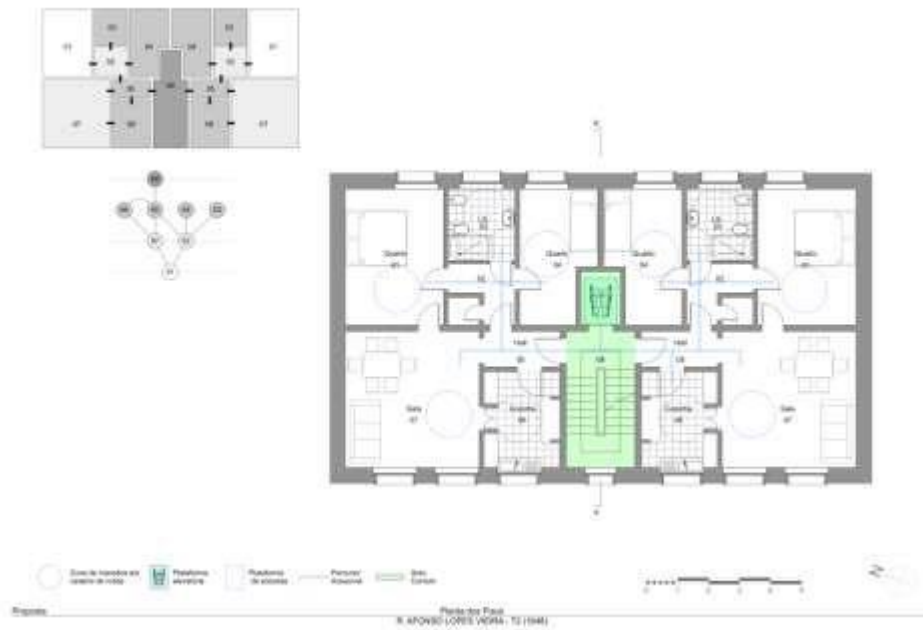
T2 Building as Assisted Housing — typical floor plan — Proposal. (Source: Carvalho, 2013)
